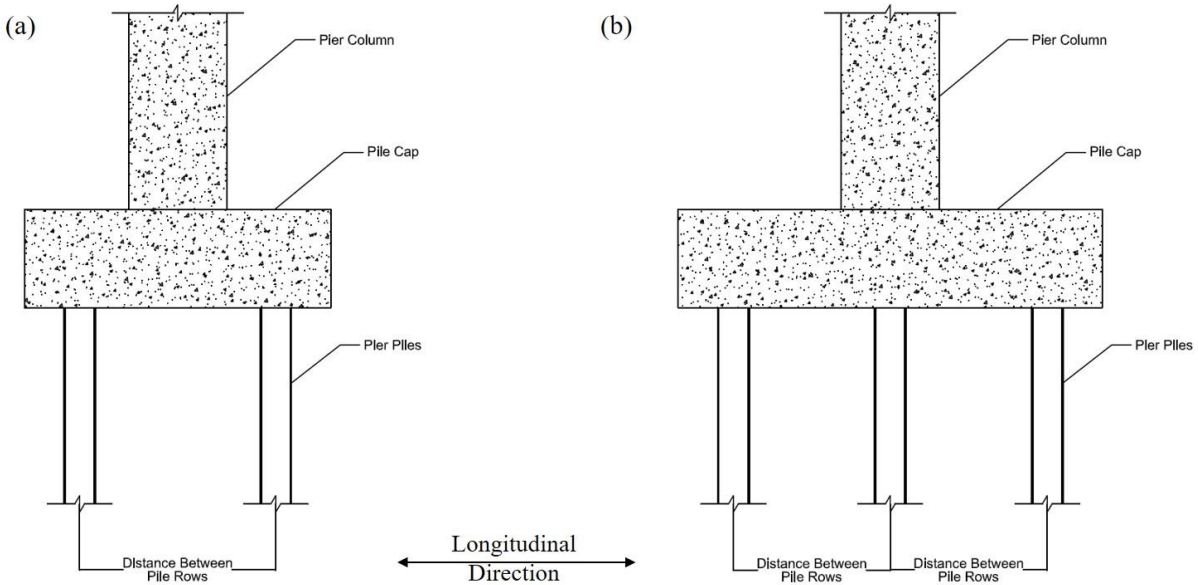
Diagram illustrating the arrangement of a pier foundation with (a) two rows of piles, and (b) three rows of piles.
